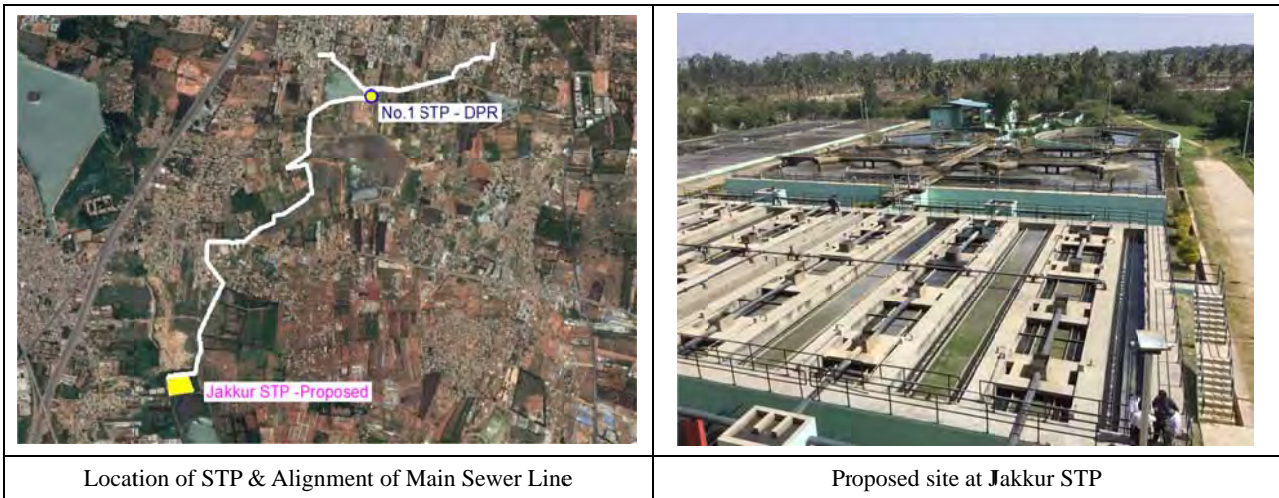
Location of No.1 STP and Alignment of Main Sewer Line
